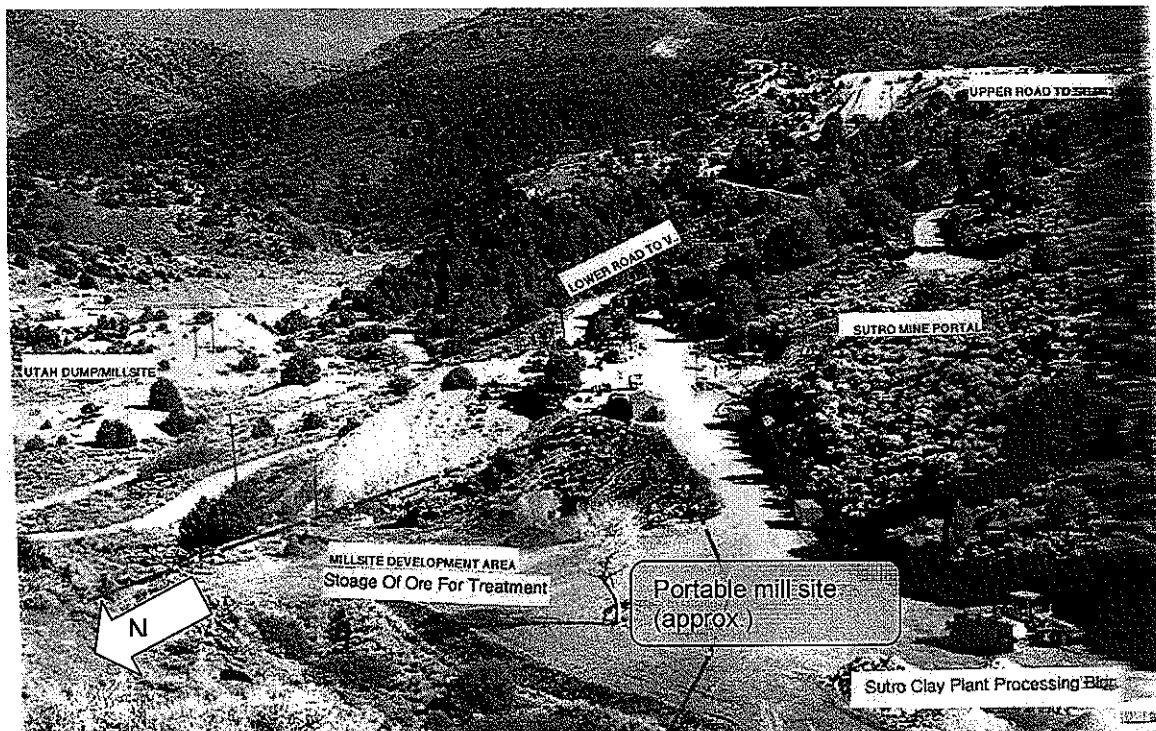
Photo of existing site. Proposed processing mill to be placed on foreground graded area.
